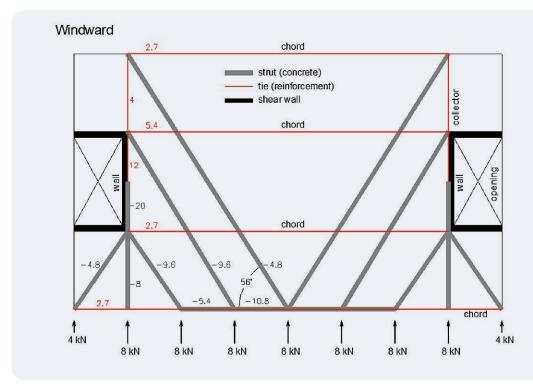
Strut and tie model for wind loads on the windward façade.
